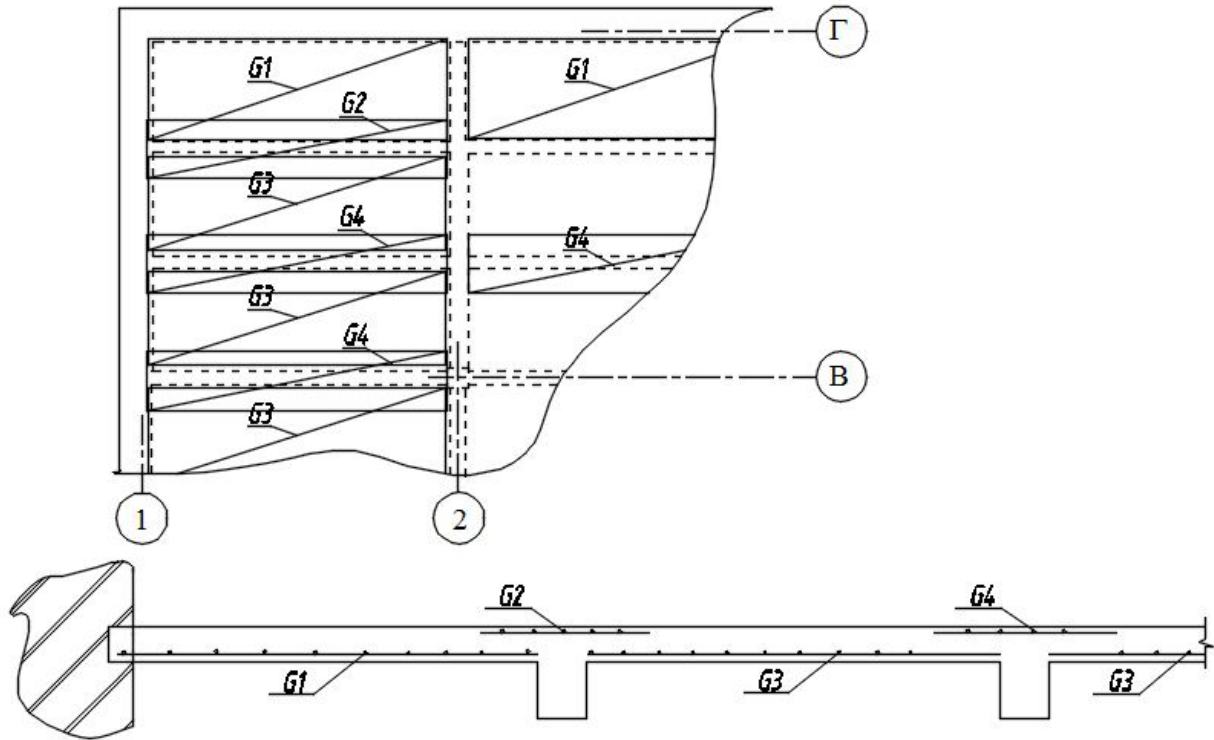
Scheme of separate reinforcement of a monolithic plate
